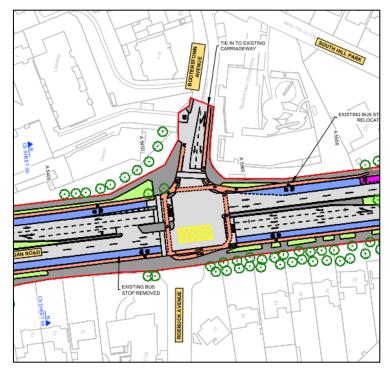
Extract from General Arrangement Drawings (Sheet 17)
